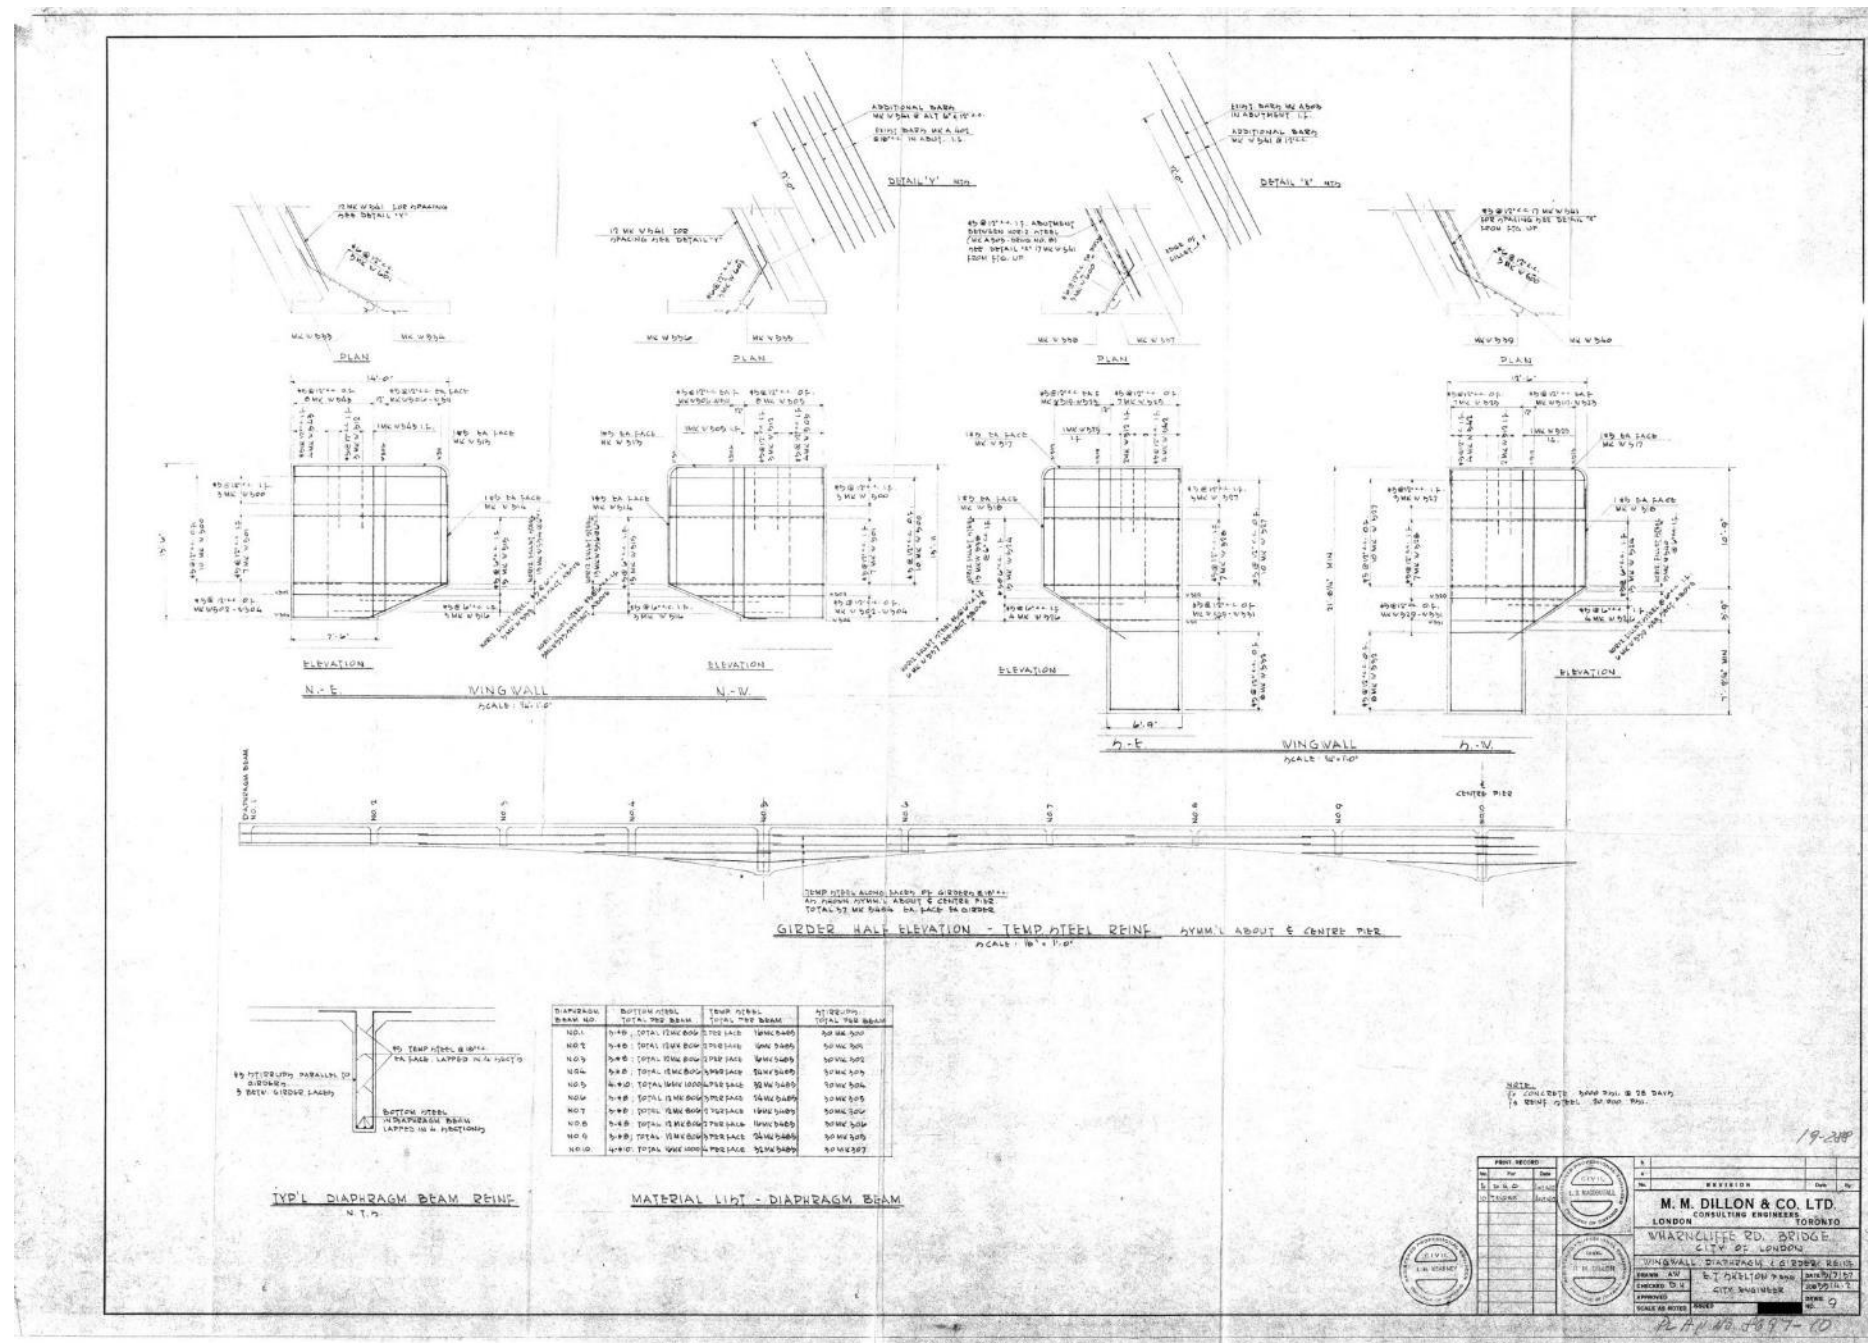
Wingwall and Girder Details of Wharncliffe Road Bridge, 1957
